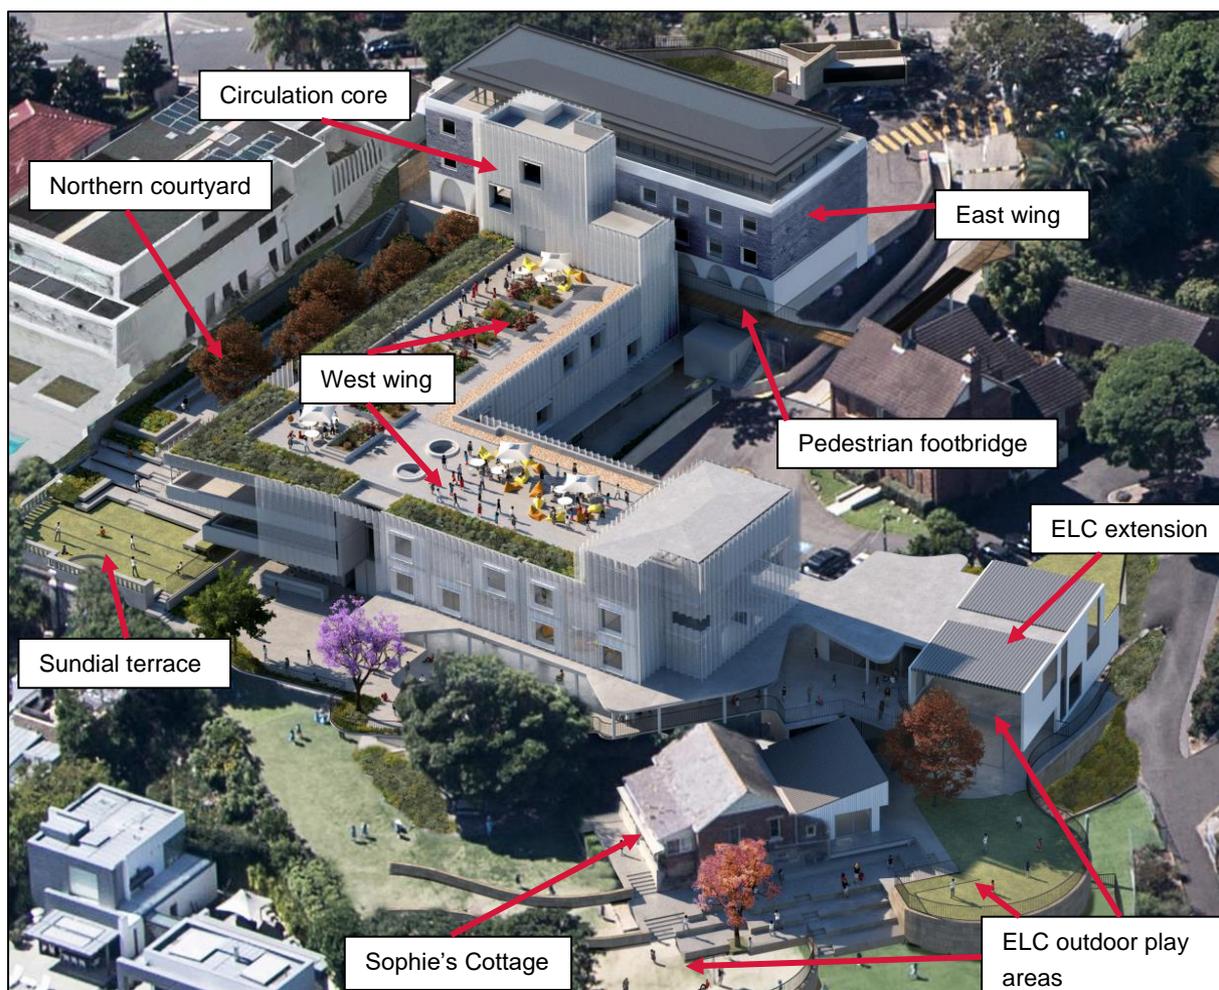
| Precinct A photo montage (Source: Applicant's RtS 2021)
